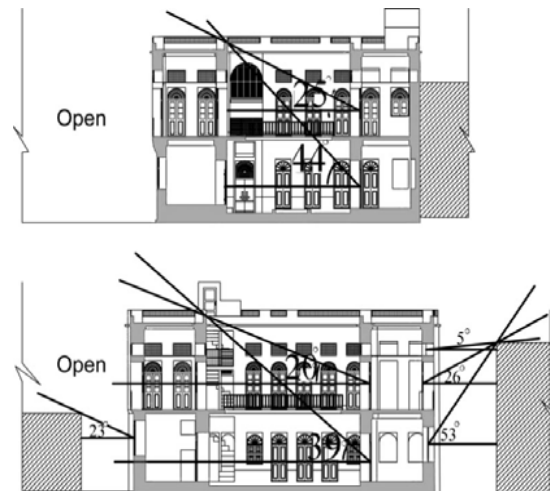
The line of shadow in transverse and longitudinal sections in Rashidy yard (authors). In first floor (main residential spaces), these angles are under 25 degrees and in ground floor is more than 25 degrees
